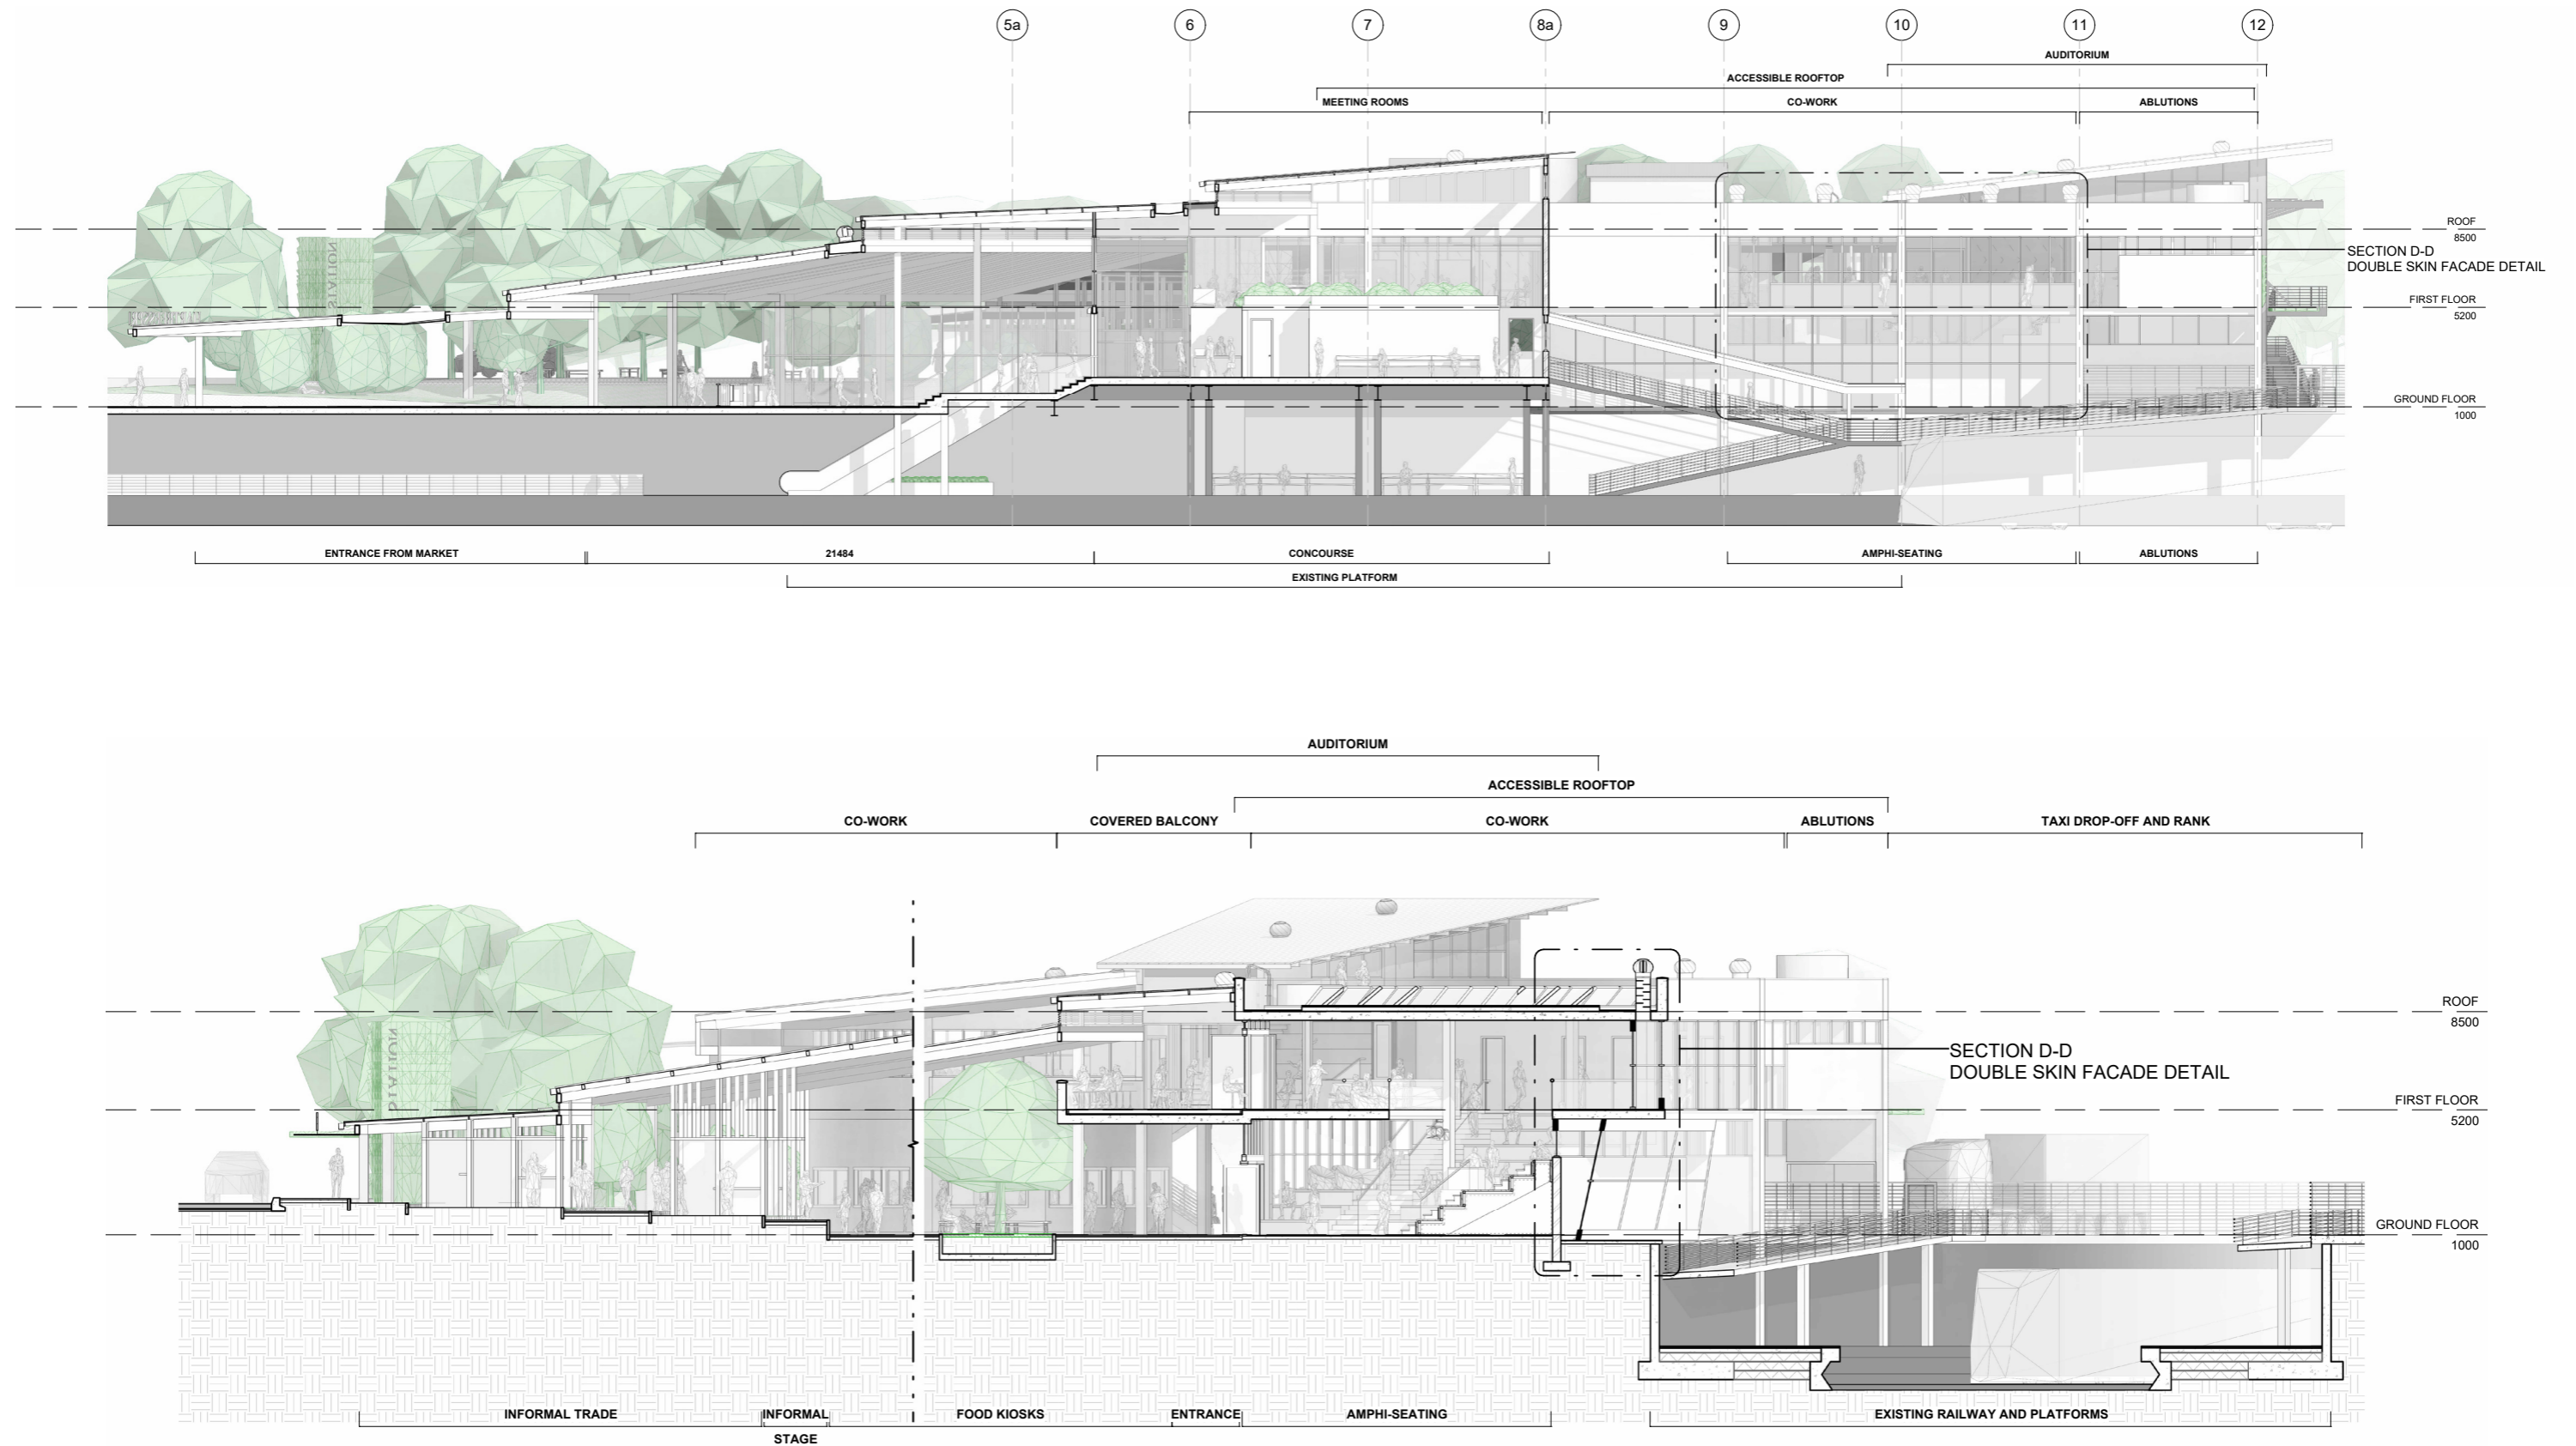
| Sections showing Frame and Roof NTS (Author 2022)
